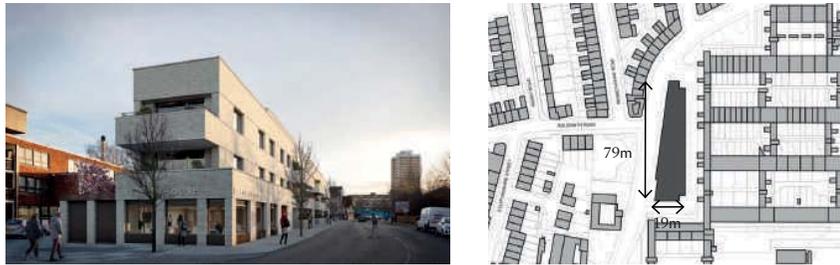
and 88: Meeting House Lane, Peckham, Photo and Plan Diagram
